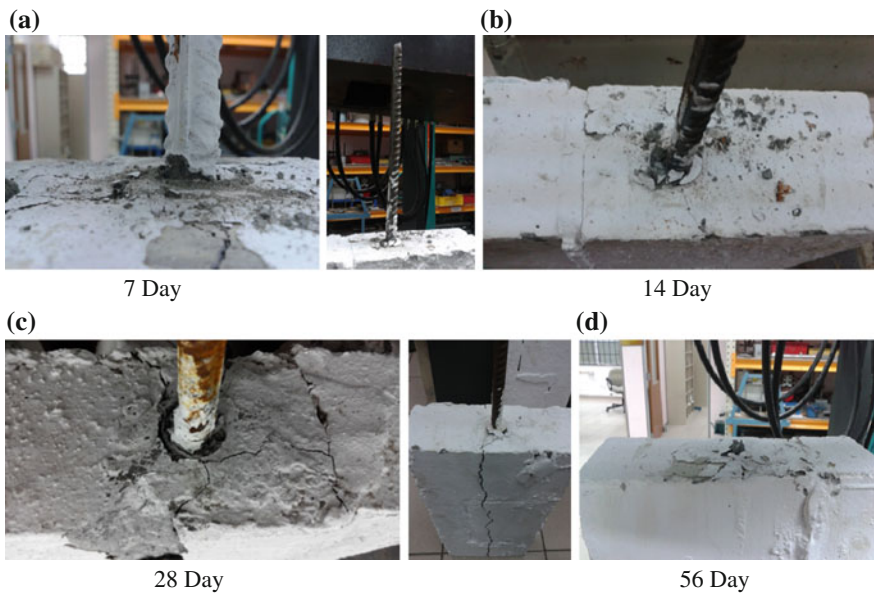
Failure characteristic behaviour on reinforcement bar of interlocking panel specimens under pullout test
